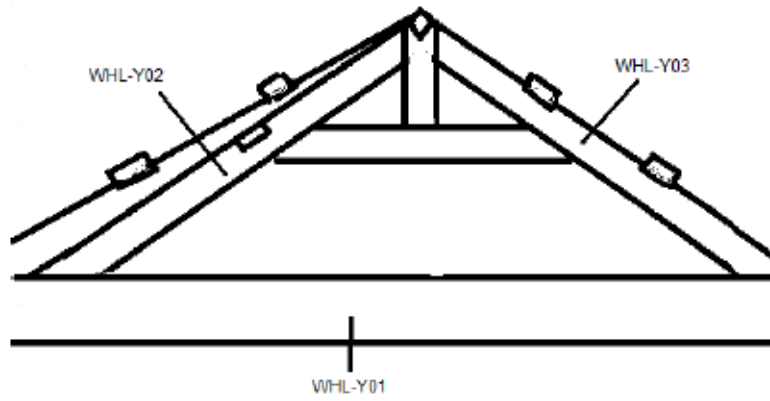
Sketch of truss 1, showing the location of samples WHL-Y01–03
